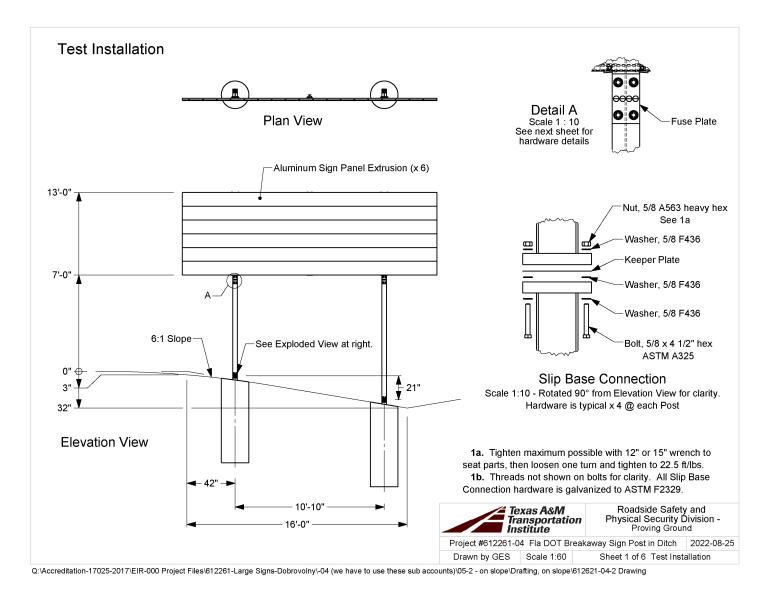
Details of Large Sign Slip Base Support for Crash Test 612261-05-2.
